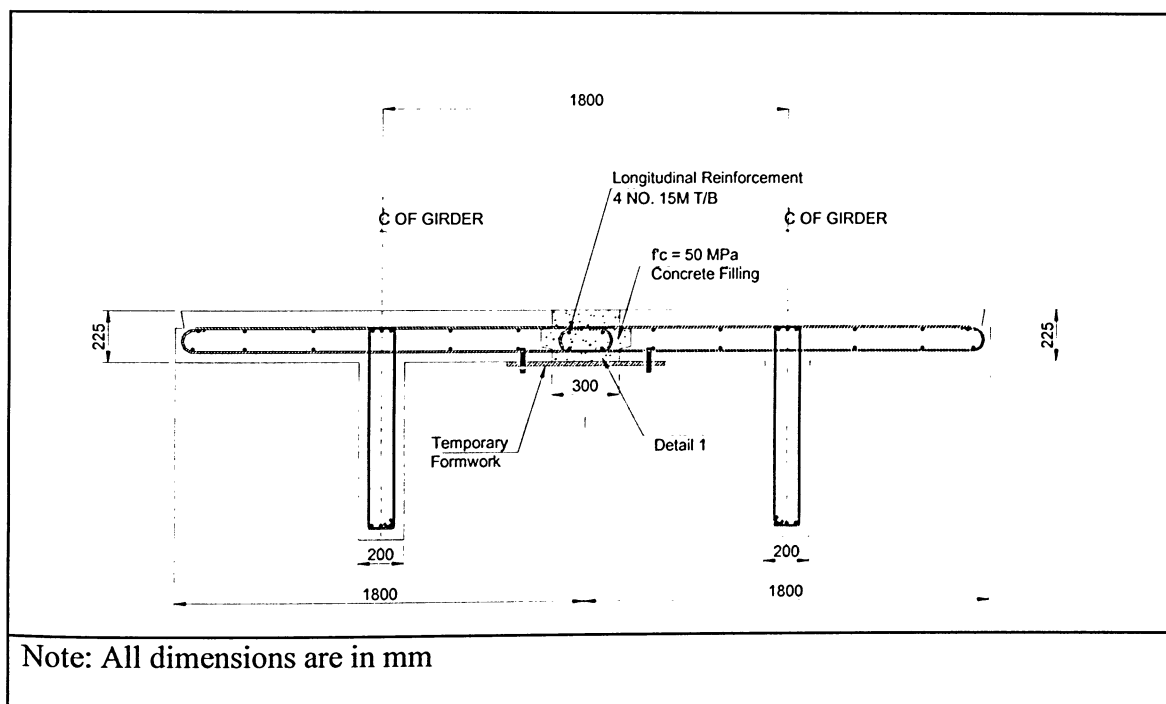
(b) Cross Section of Model M2 after Grouting
